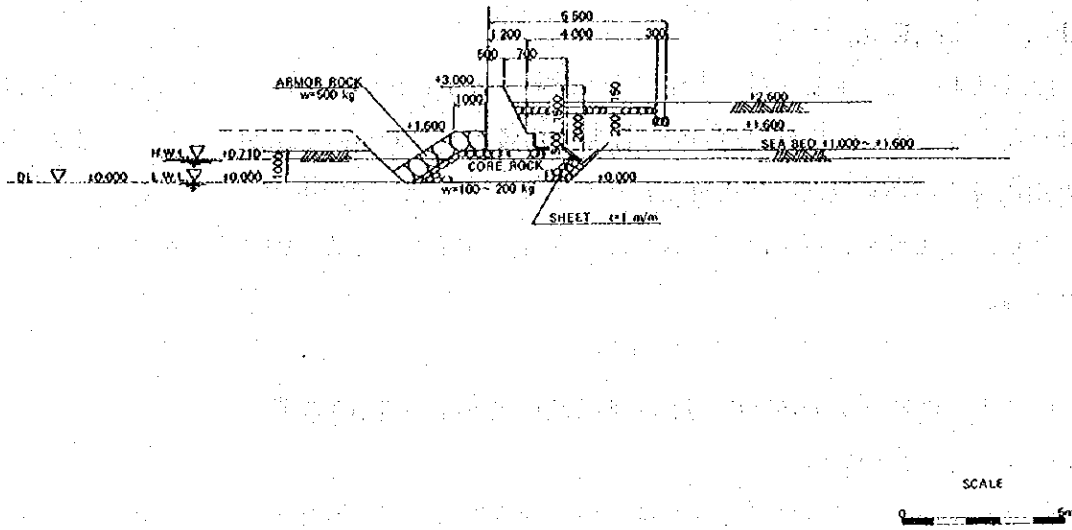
Cross Section of Rock Bulkhead – Sual Port
